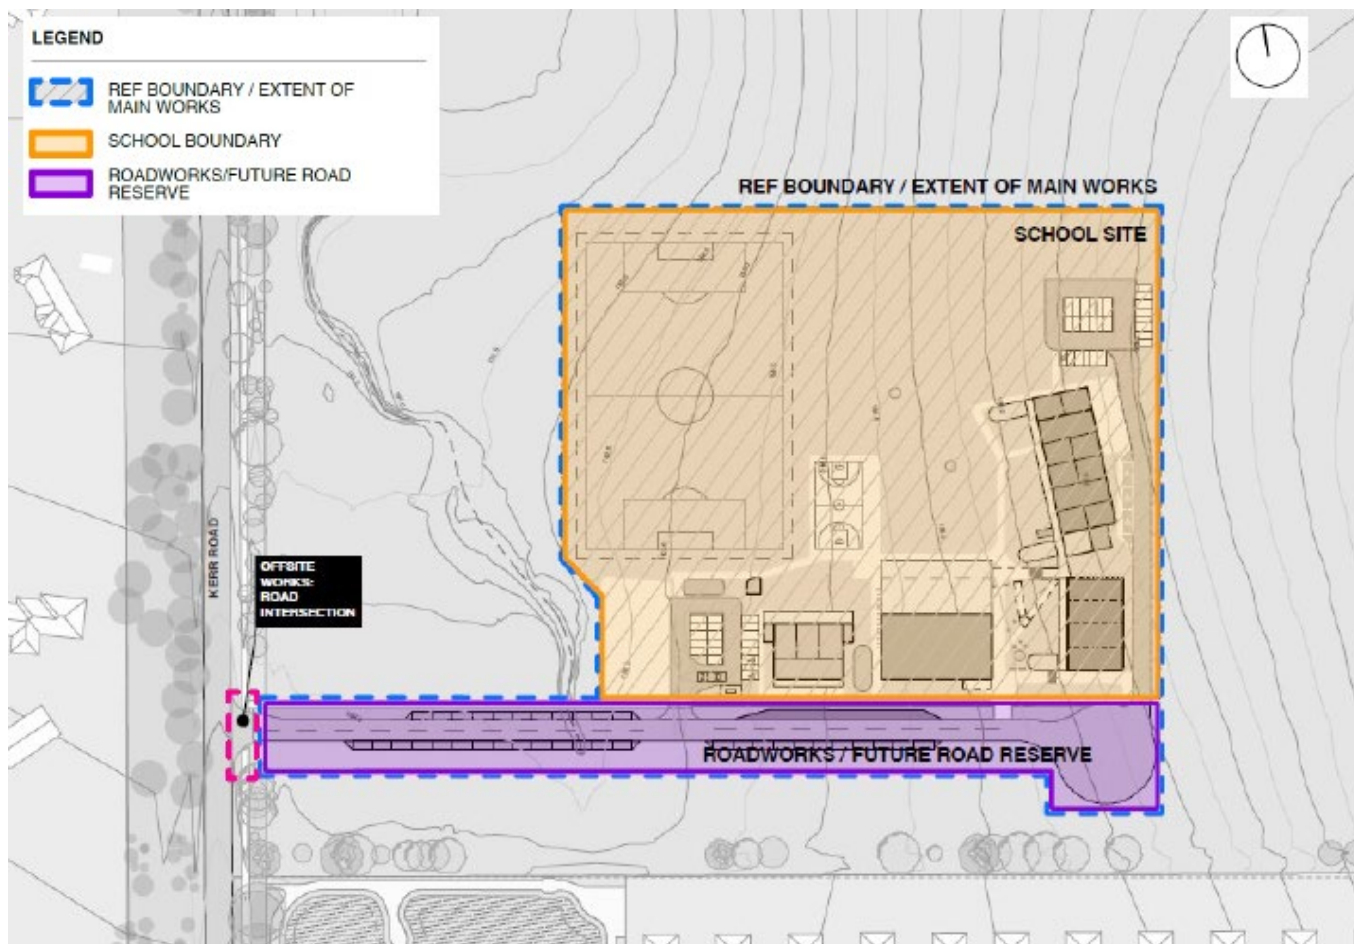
Extent of proposed works at Albury Thurgoona New Primary School and New Public Preschool (Source: Bennett & Trimble)
